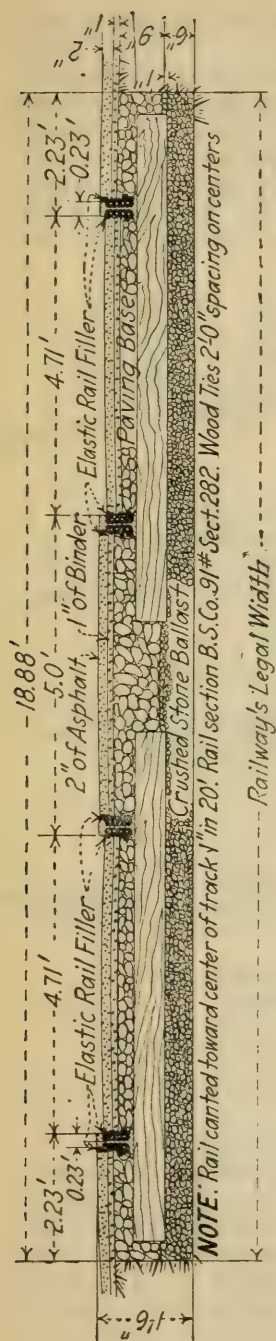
Typical car track sections (State of New Jersey, 1922).
